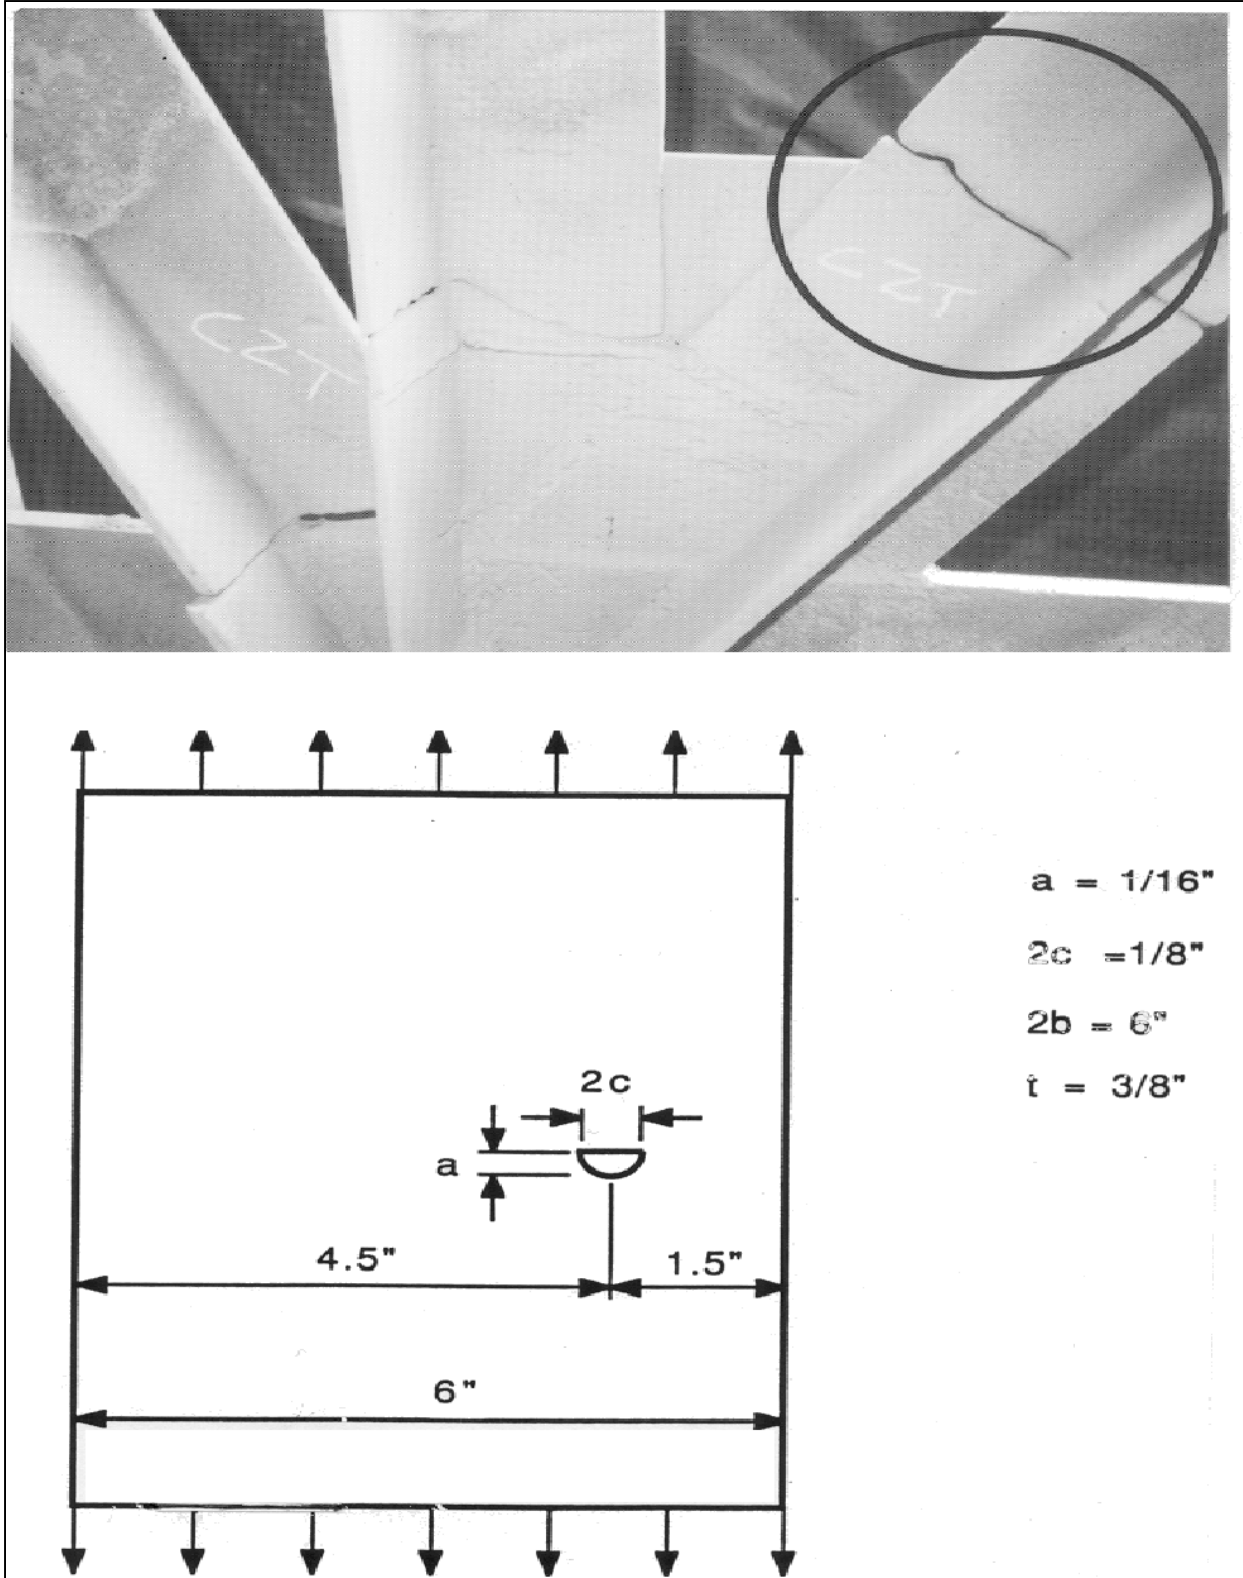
A stiffening member with a crack (1 in. = 2.54 cm)
